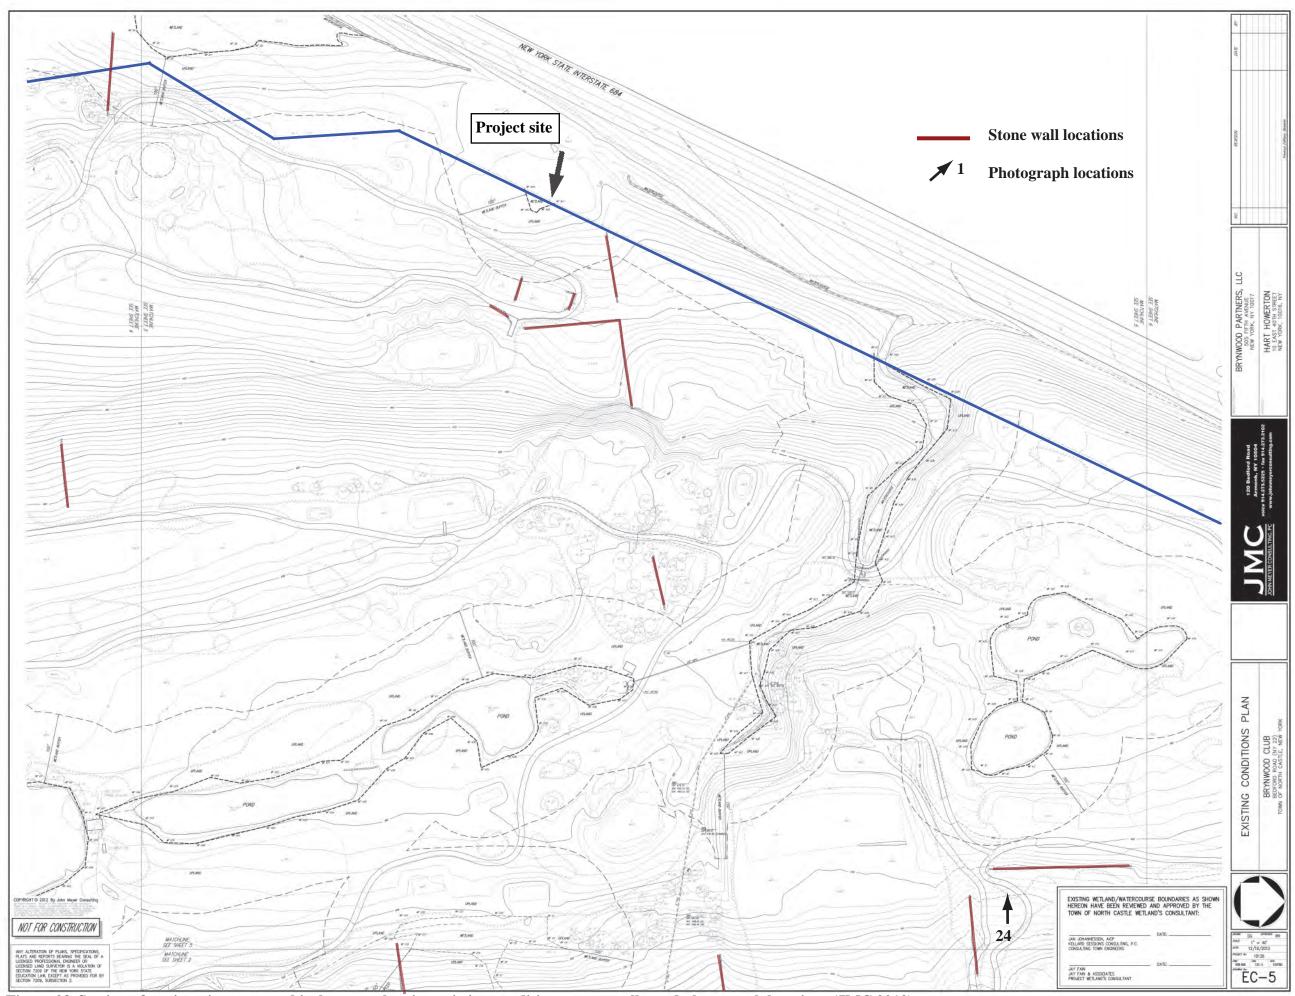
Section of project site topographical survey showing existing conditions, stone walls, and photograph locations (JMC 2012).
